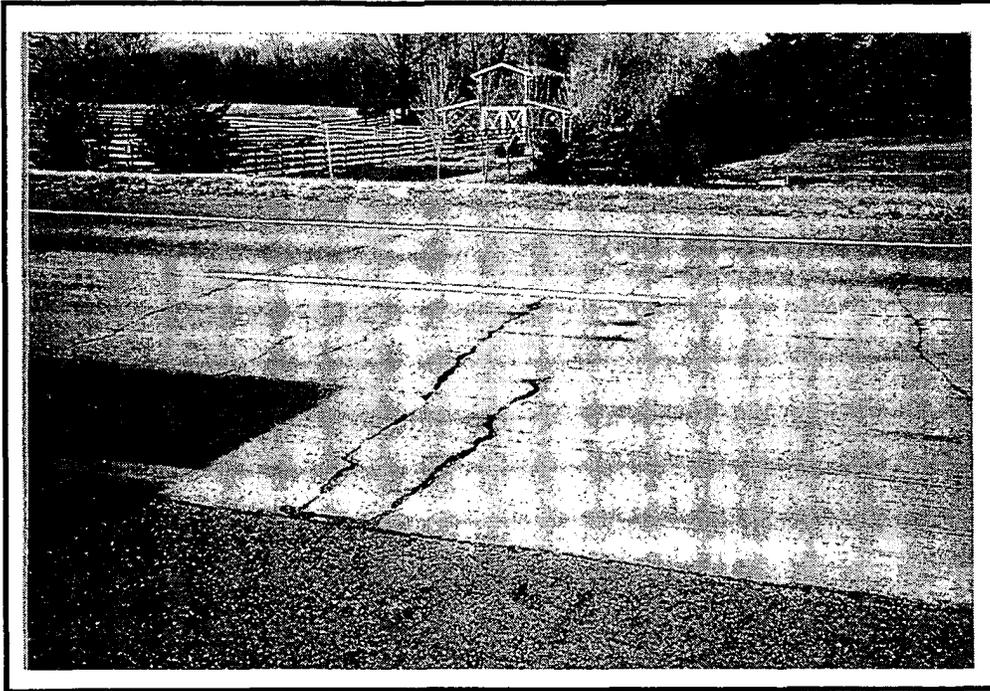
Spalling in CRC Pavement, Medium Severity
